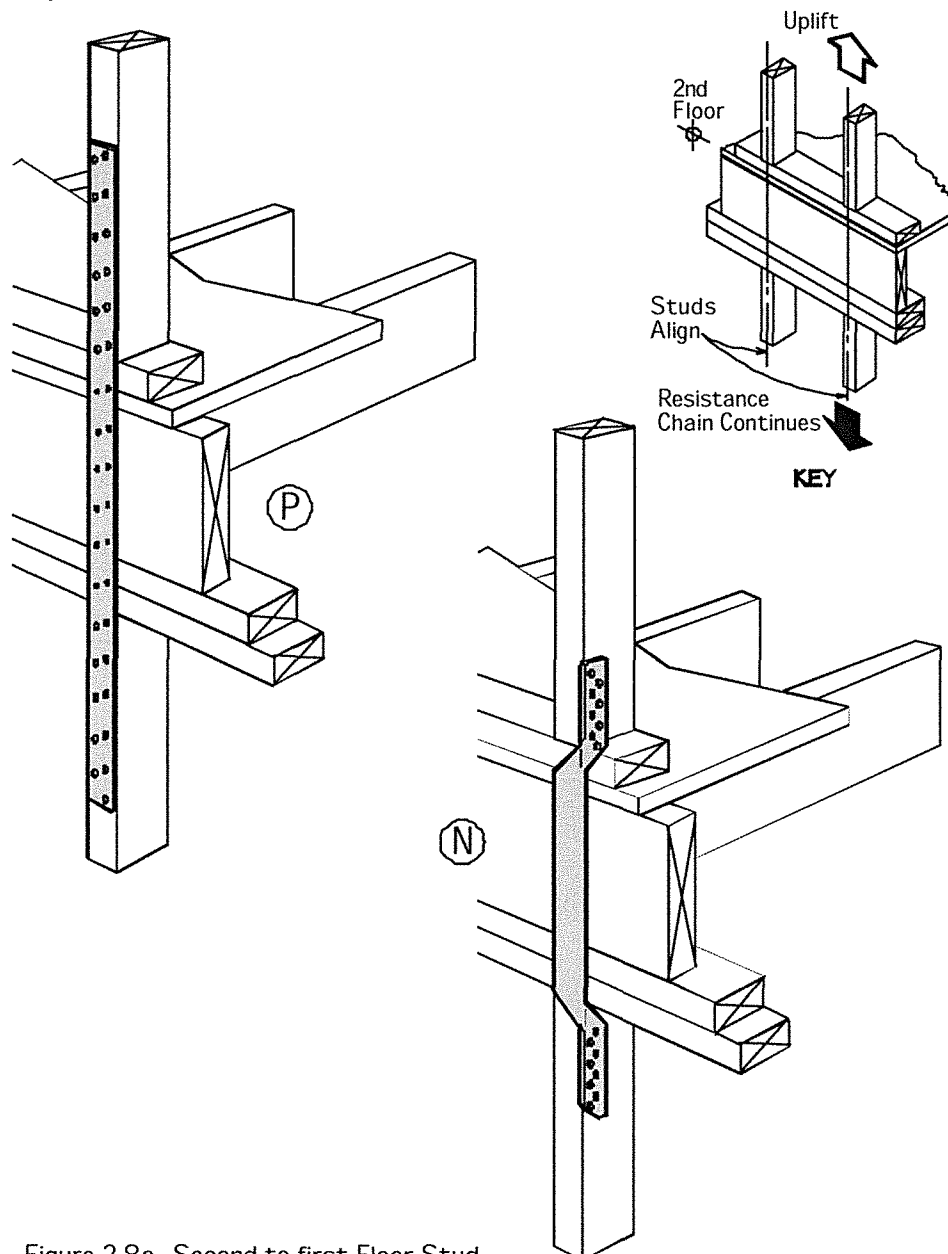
Second to first Floor Stud Connection-Alignment between Studs
